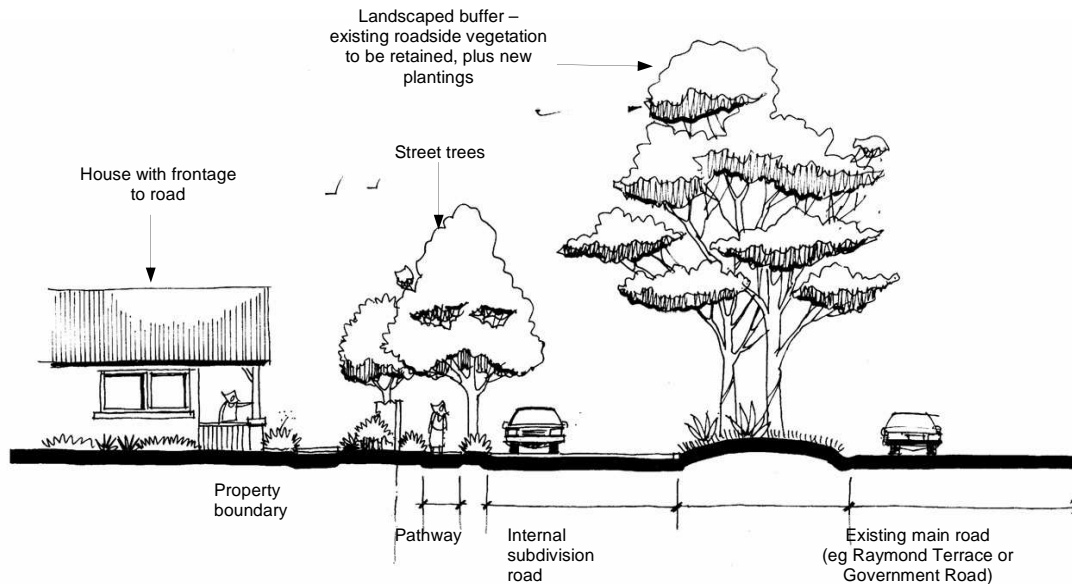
Internal subdivision design adjacent to Raymond Terrace Road and Government Roads
